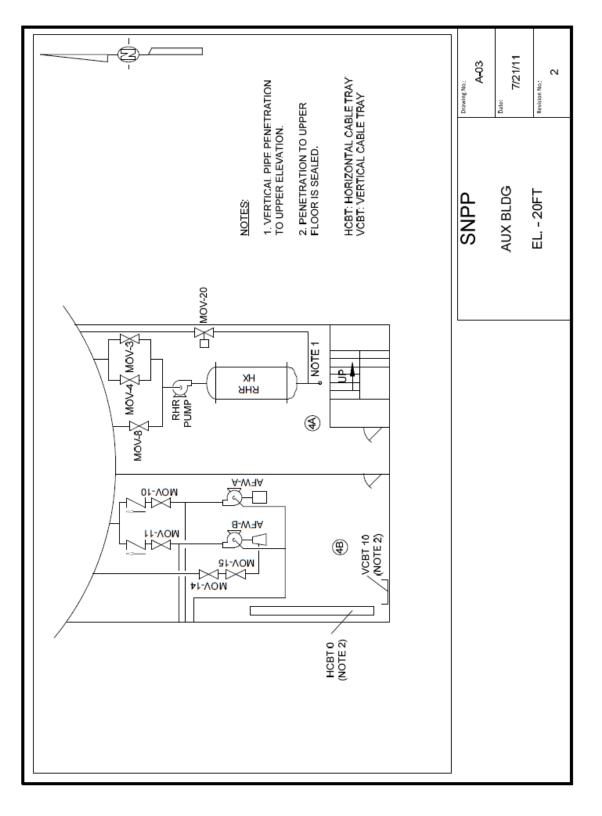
Auxiliary Building - Elevation 20 Ft.
